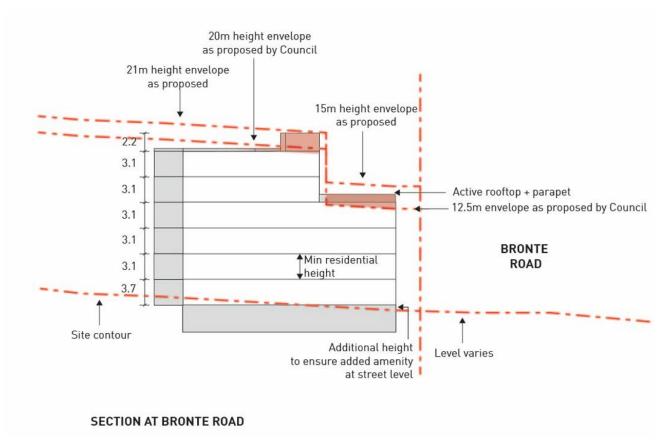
Bronte Road section of ILU envelope Source: Cox
